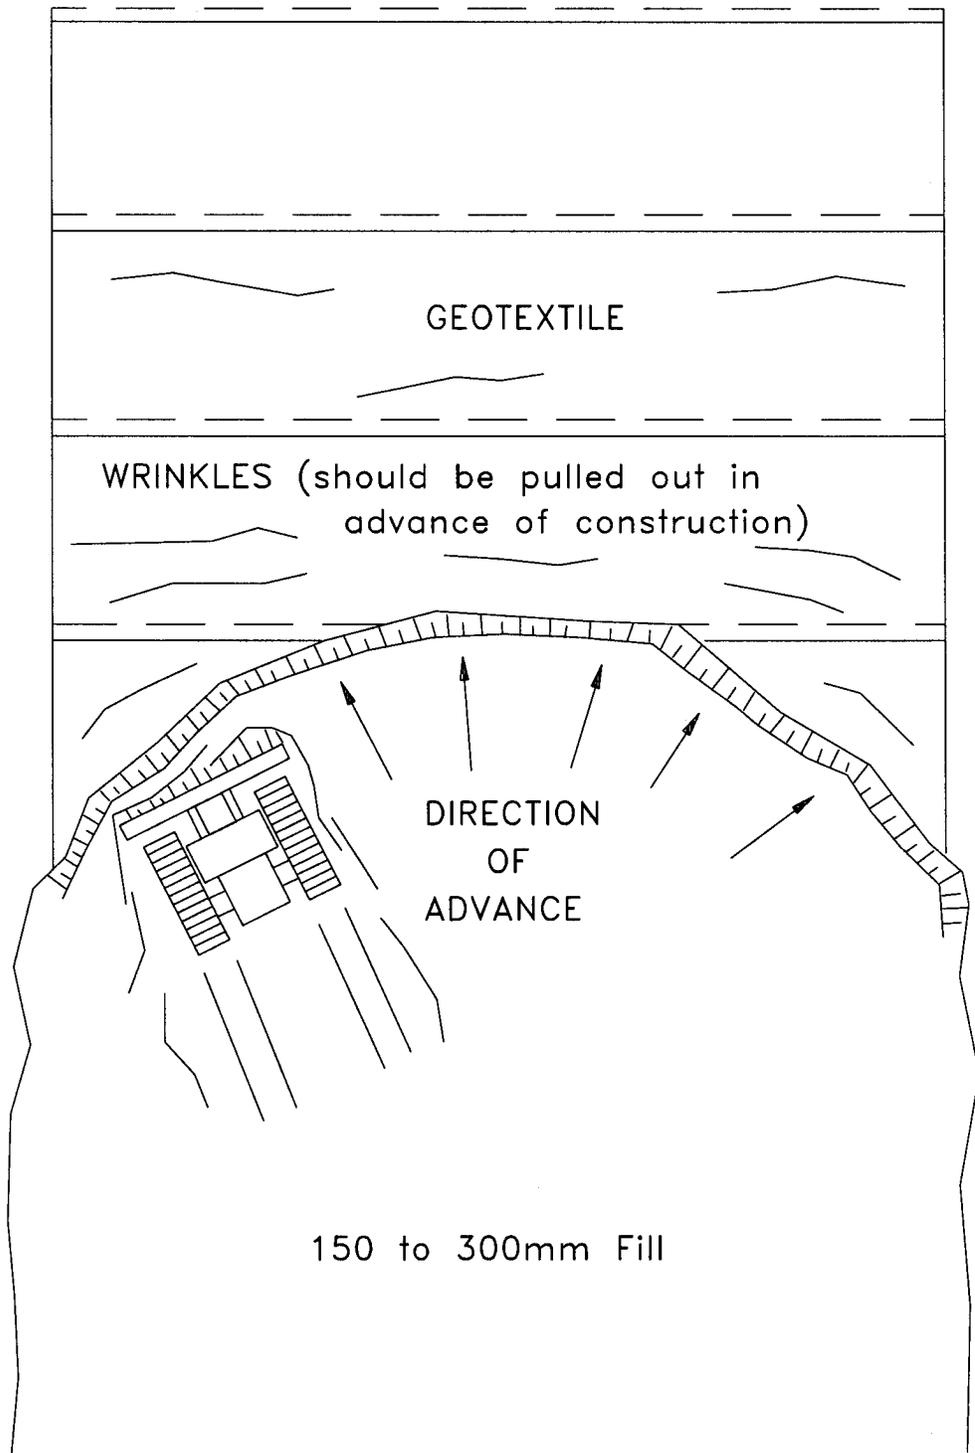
Fill placement to tension geotextile on moderate ground conditions; moderate subgrade (CBR > 1); no mud wave.
